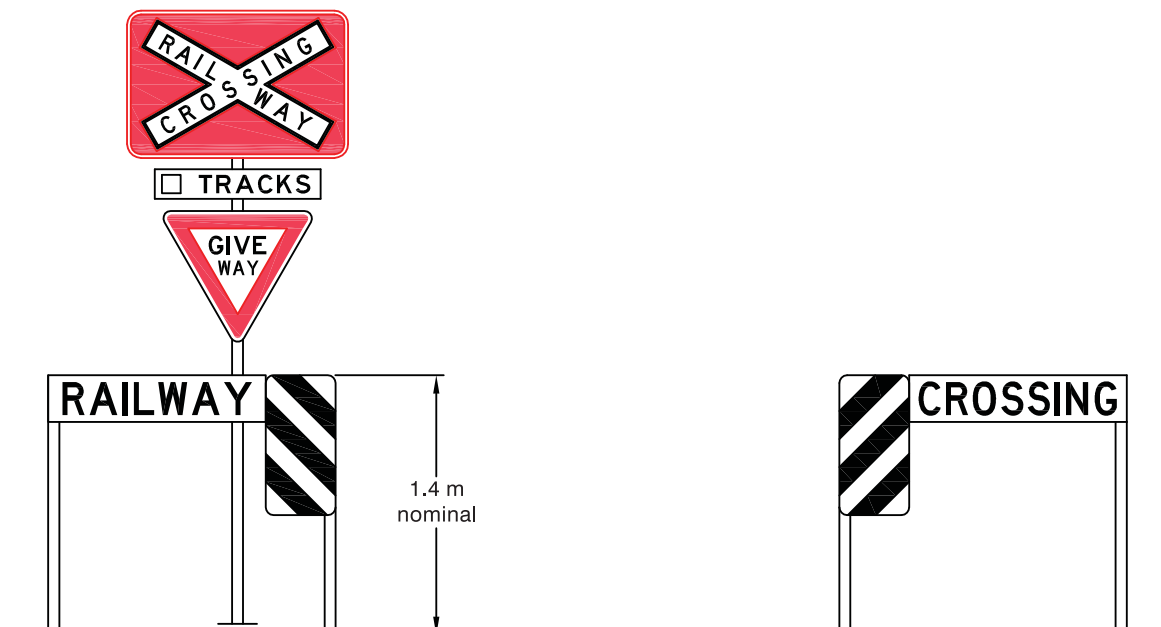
ARRANGEMENT OF RAILWAY CROSSING SIGNS WITH WIDTH MARKERS
